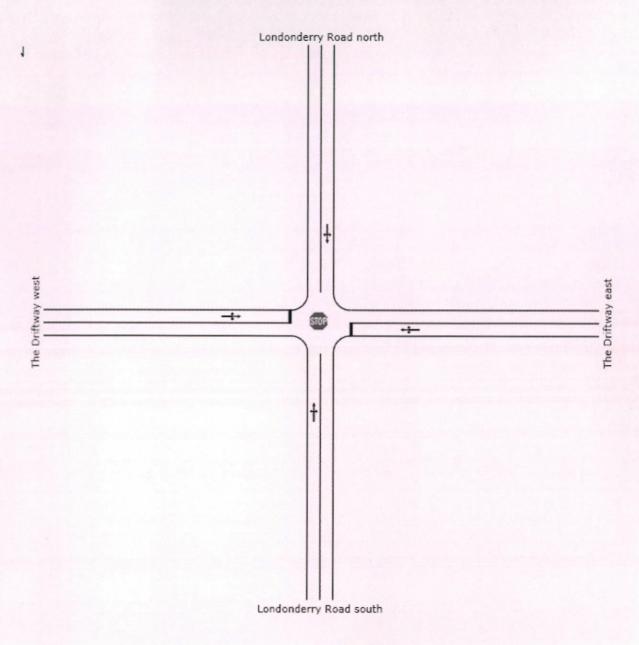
Stop Control Intersection Layout of Londonderry Road with The Driftway (SIDRA)
